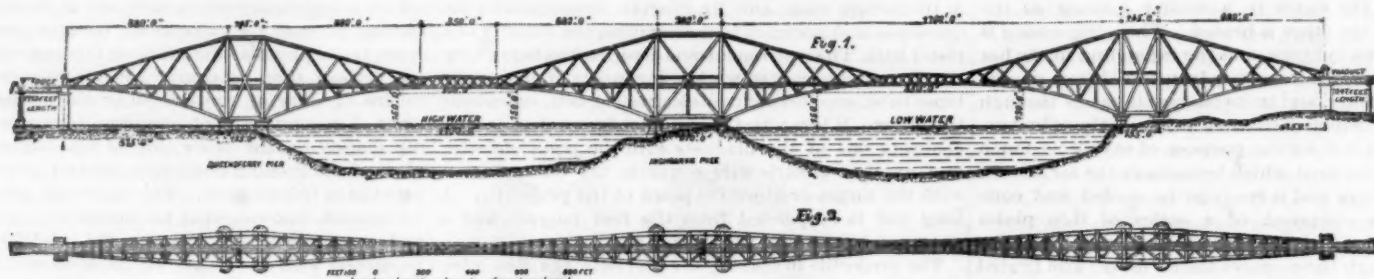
THE FORTH BRIDGE.—ELEVATION AND PLAN.
